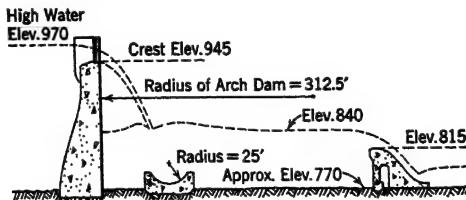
Stilling basin of the Calderwood Arch Dam.
